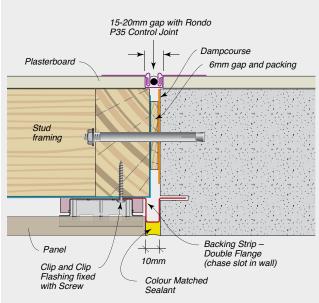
Typical Junction with In-line Masonry Wall – Plan View
